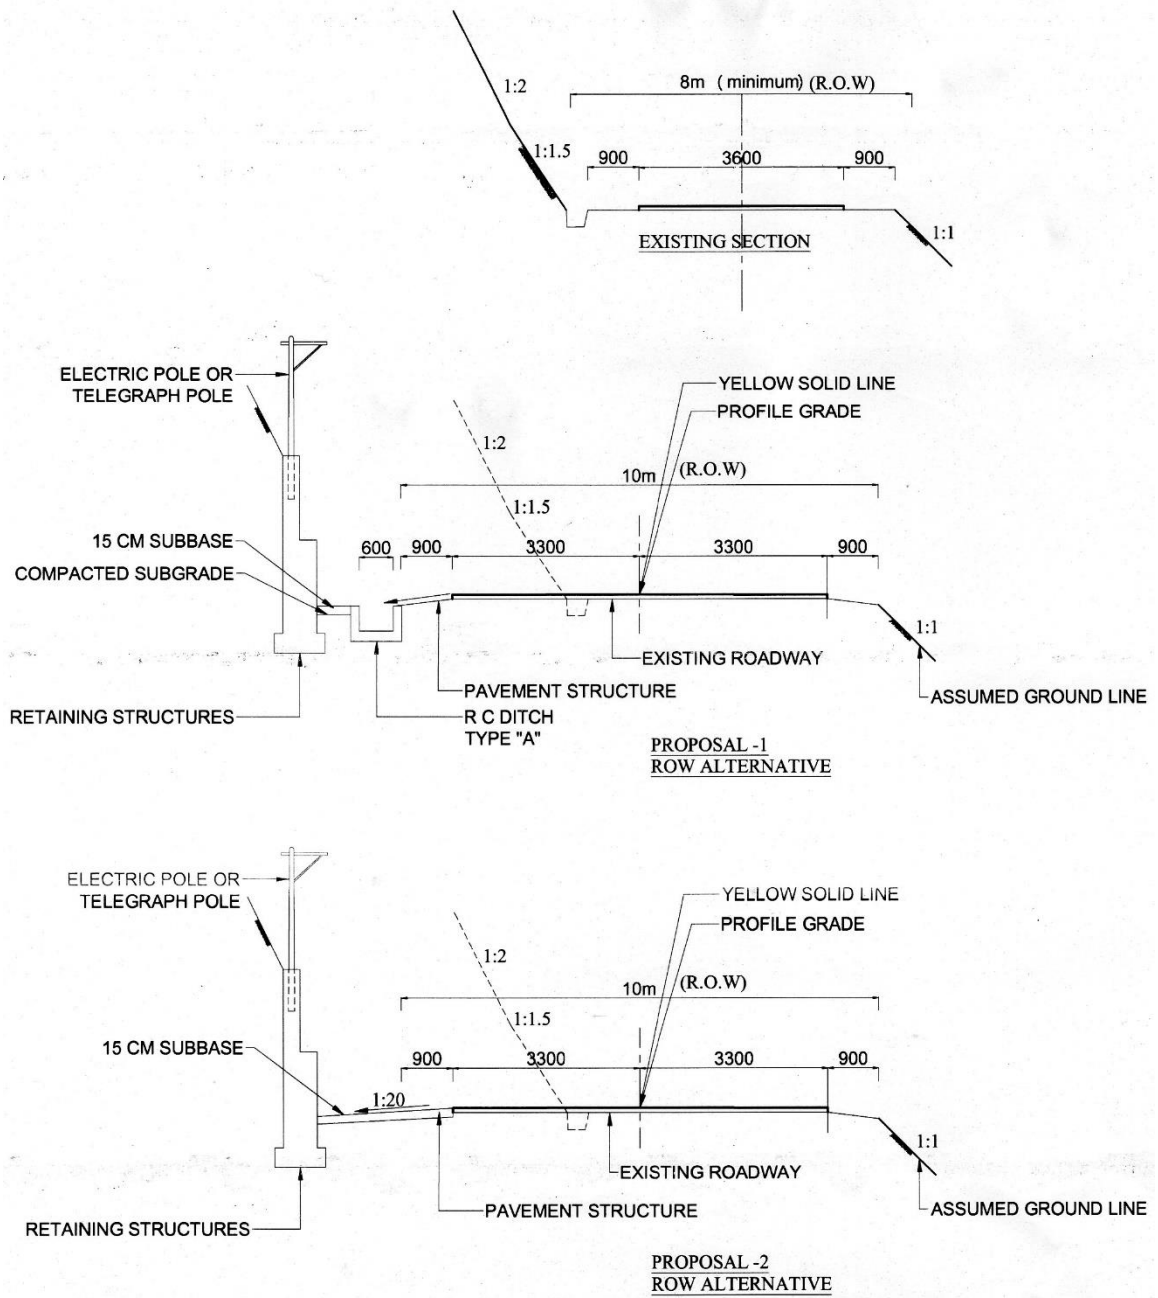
10 Alternative cross Sections designed by PESD(Sabaragamuwa)
